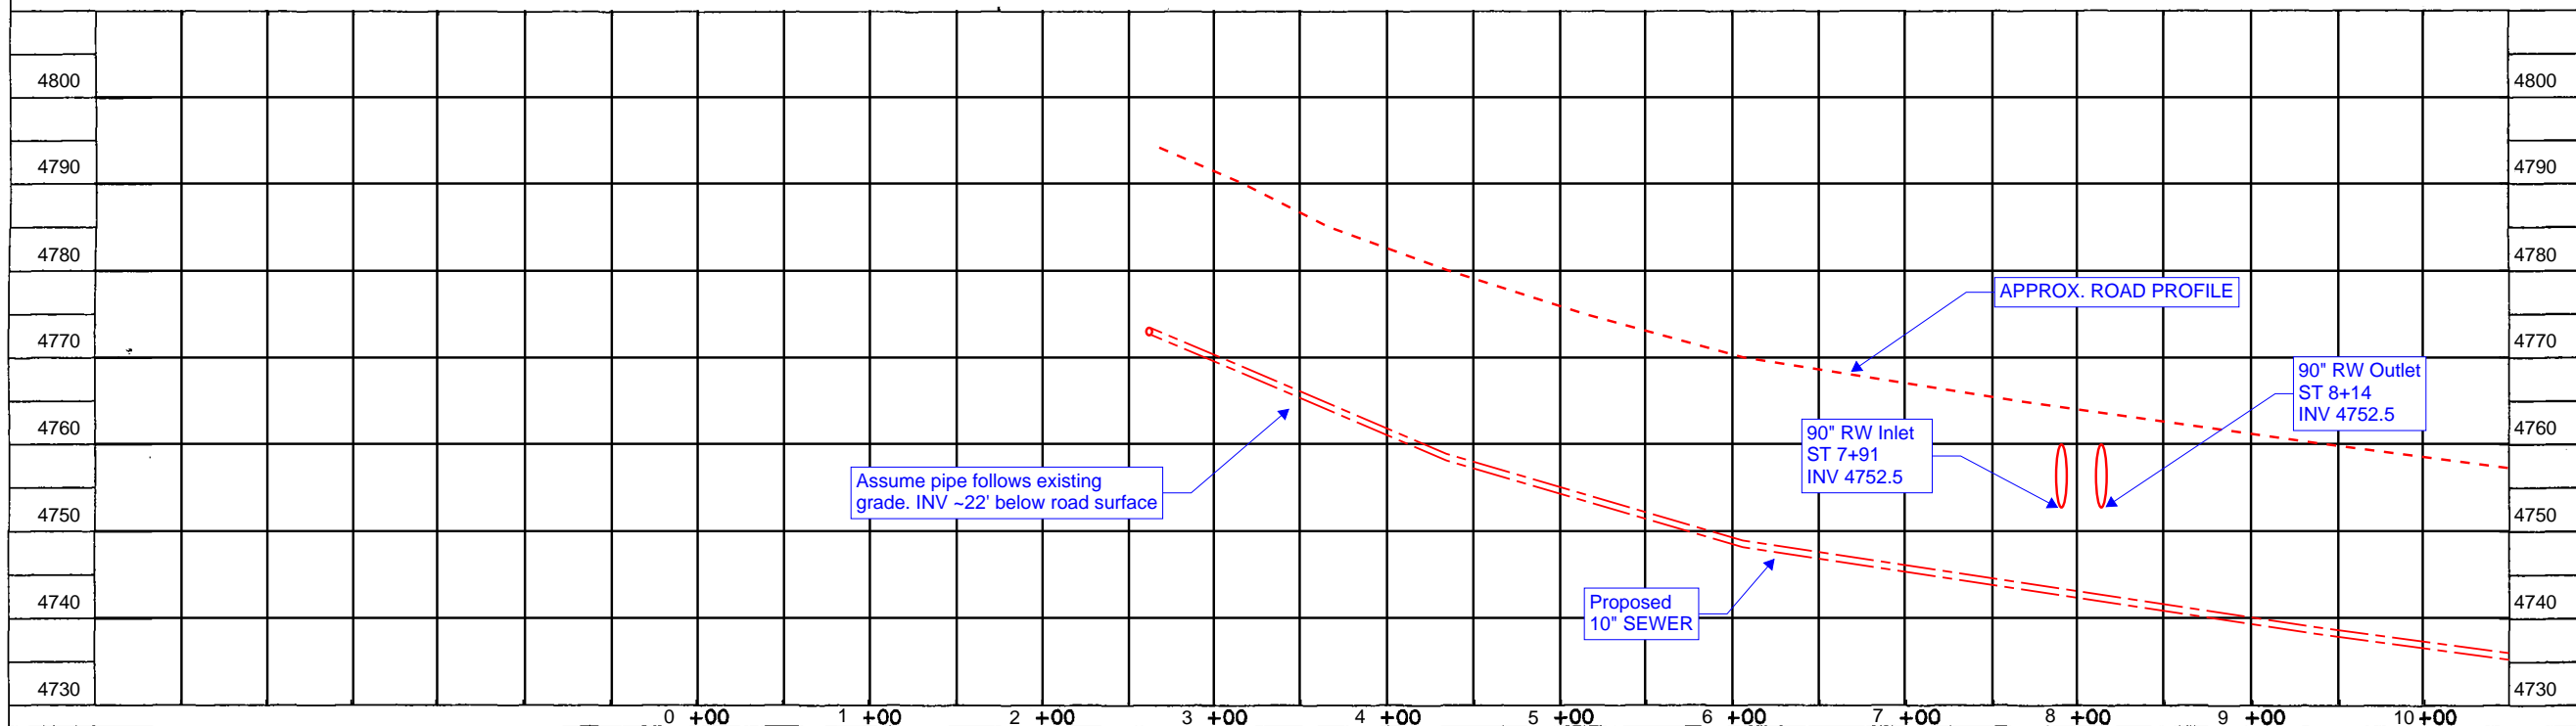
3200 W 10" SEWER PLAN AND PROFILE (FW)
